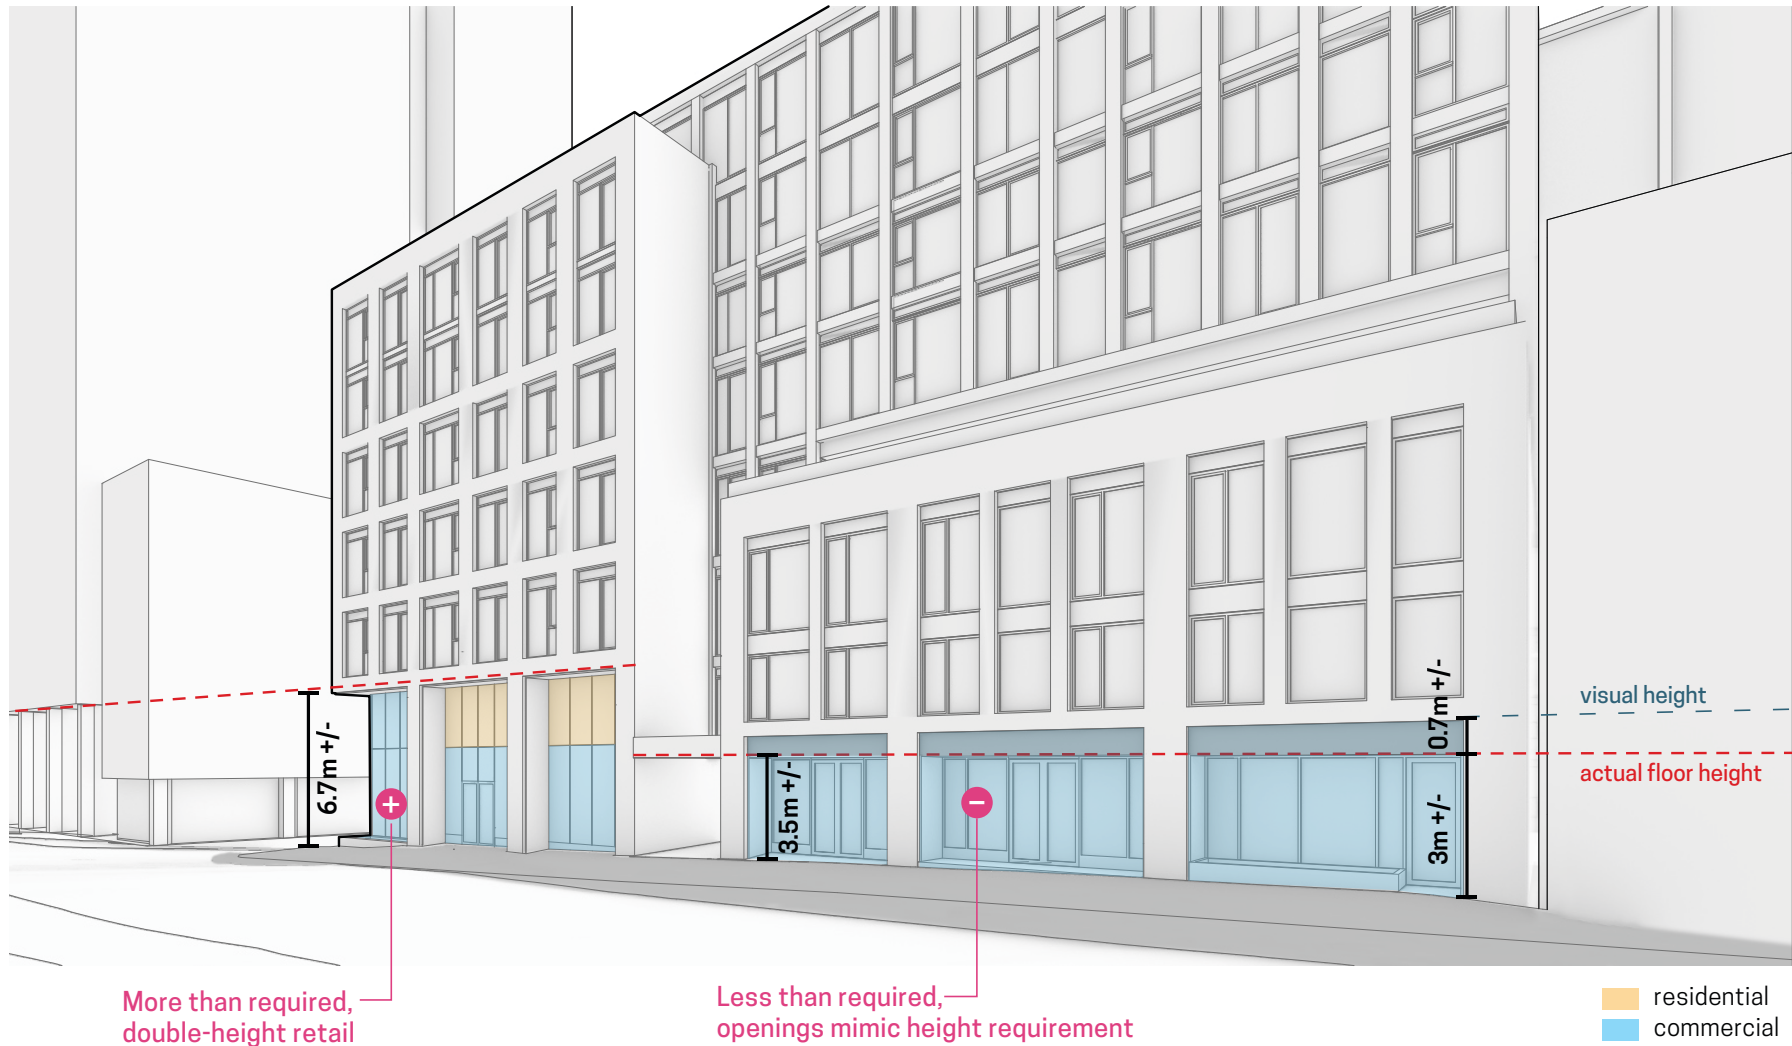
c Land-use at Grade: Resulting streetwall at corner of Barrington and George. Refer to Section 303 for slab heights.
